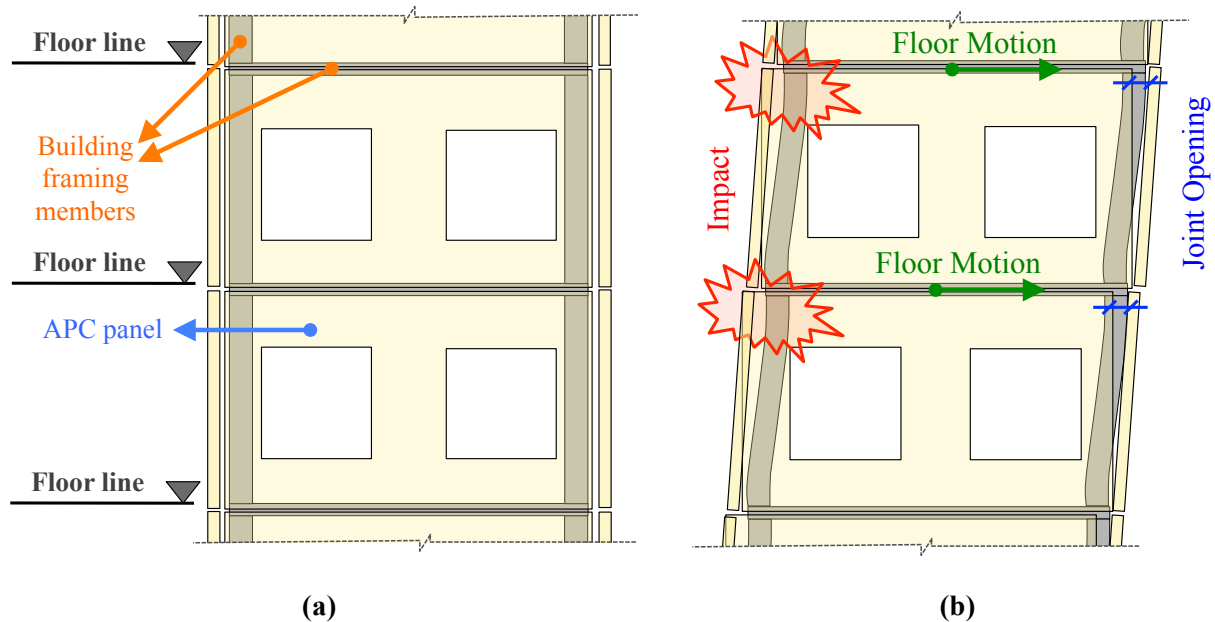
APC cladding attached to a building frame (a) undeformed and (b) deformed during seismic displacement.
